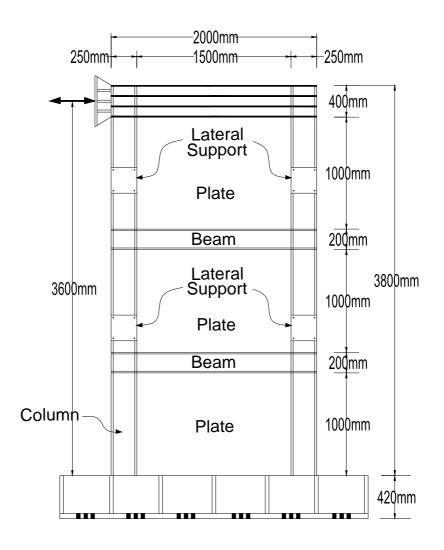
Details of Specimen Tested by Park et al. (2007)
